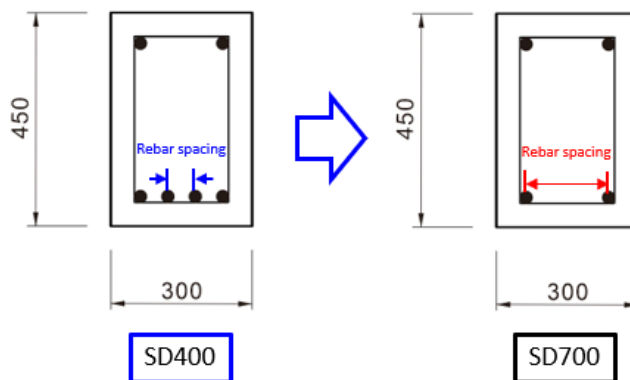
Rebar spacing for using SD400 and SD700 rebar
